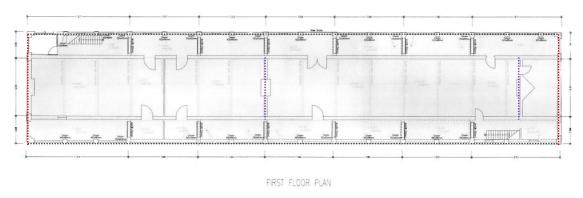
2013 1/F record framing plan, with brick structures highlighted in colour dotted lines: red = brick gable wall, purple = brick chimney stack and cross wall, light orange = brick cross wall, blue = external brick arches/ columns, light blue = internal brick wall. (Source: Architectural Services Department, Structural Appraisal Report 2013)
